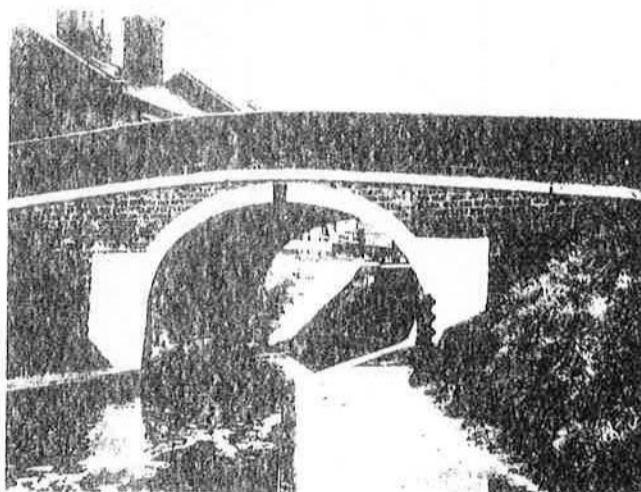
Public road bridge at Tyrley on the Shropshire Union Canal. (PFP)
